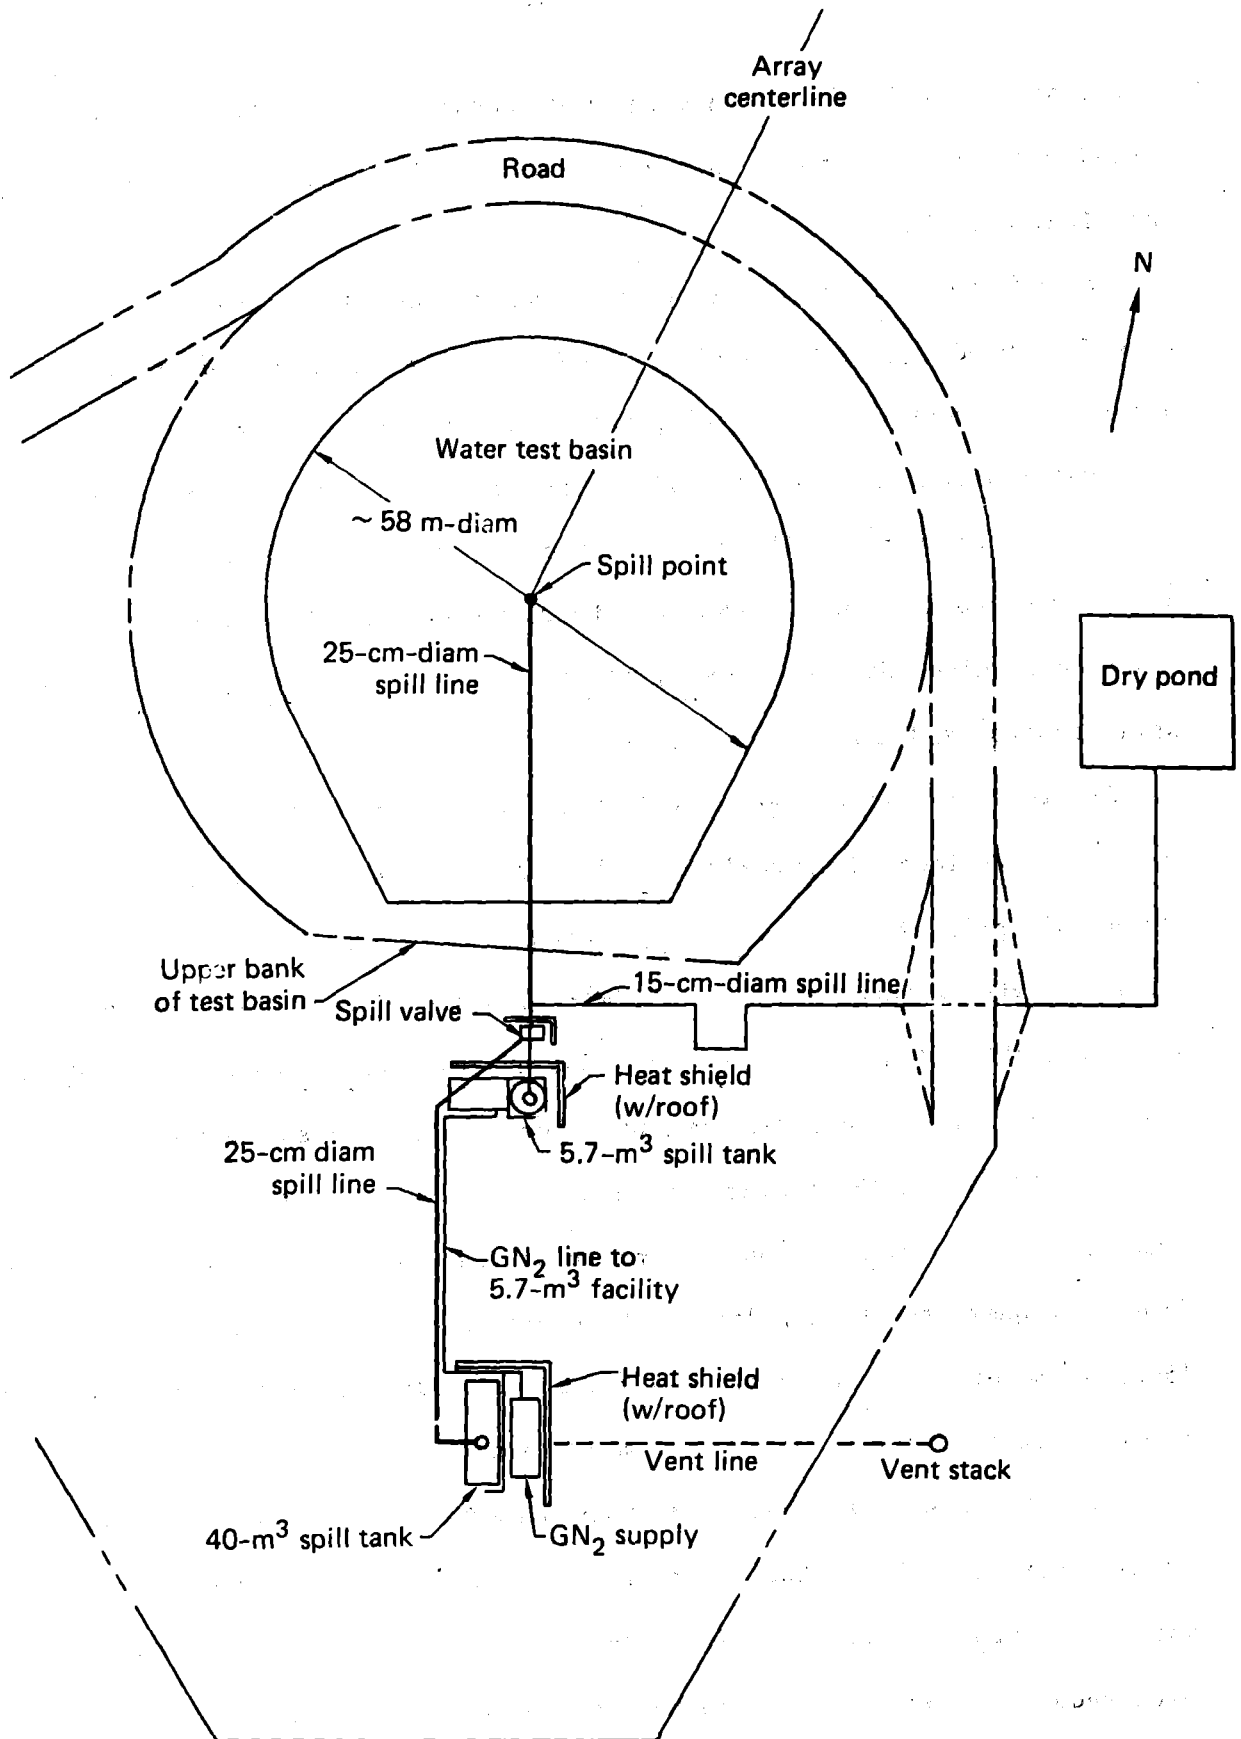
Site plan of Naval Weapons Center (NWC) spill facility at China Lake.
